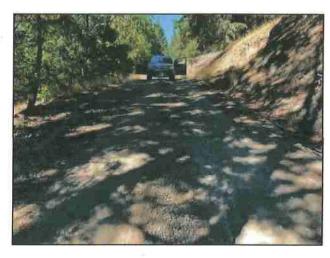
Private Access Rd @ Turnout Looking NW  $\,$
